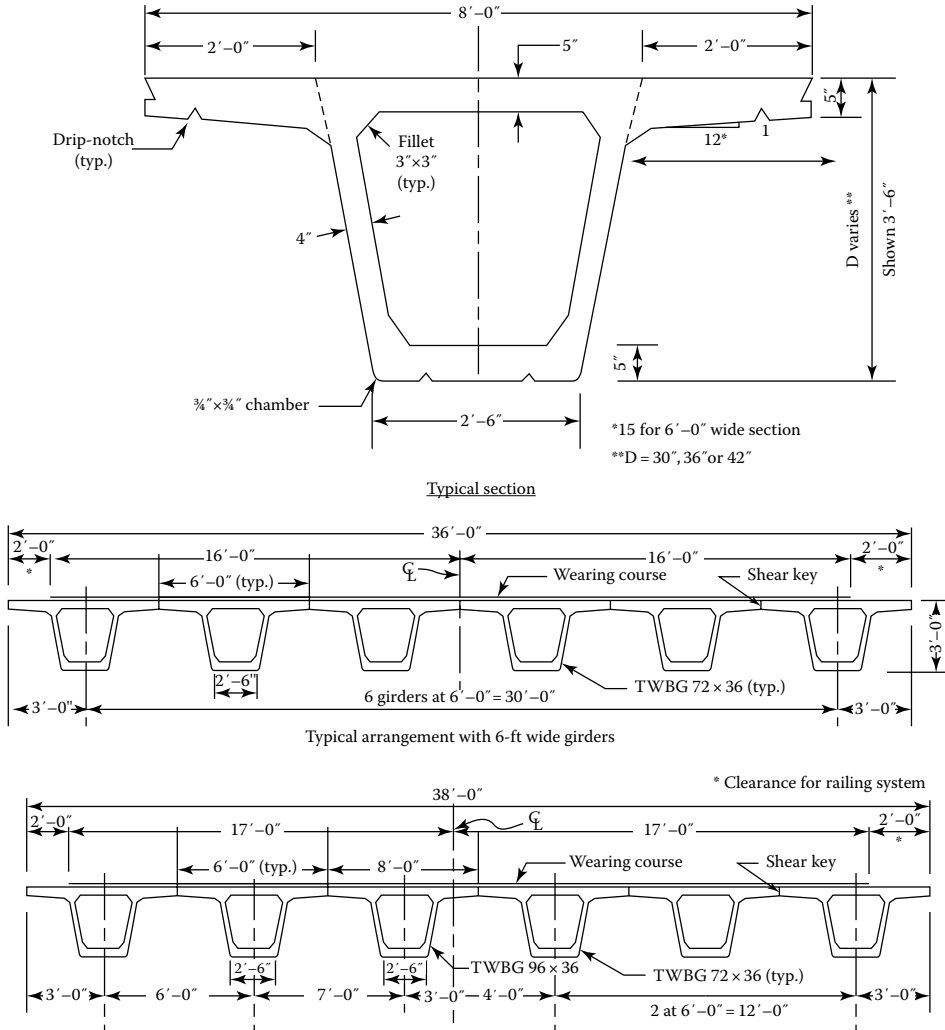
Precast, prestressed trapezoidal T-box girder system. (From Taly, N., *Development and Design of Standardized Short Span Superstructural Bridge Systems*, Ph.D. Dissertation, Civil Engineering Department, West Virginia University, Morgantown, WV, 1976..)
